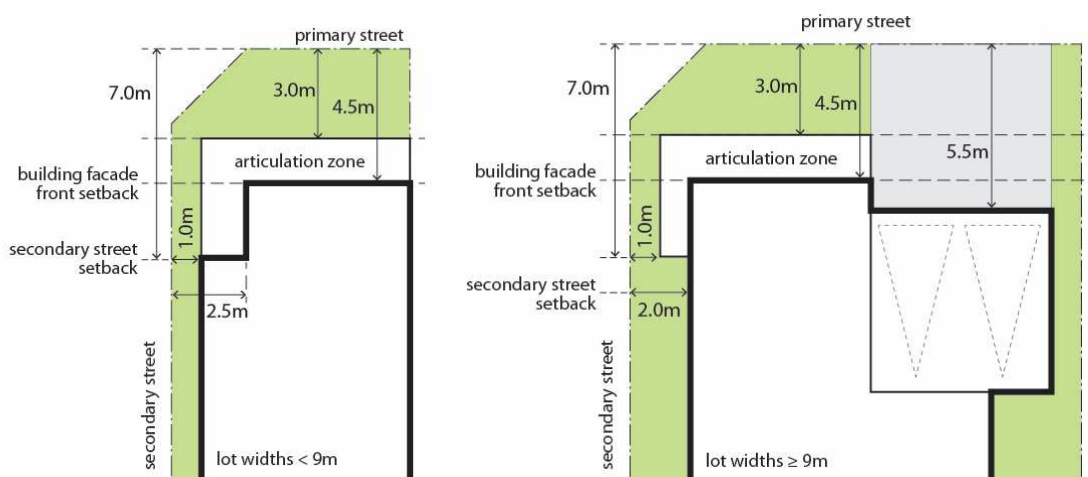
Minimum Setbacks on Corner Lot Dwellings
